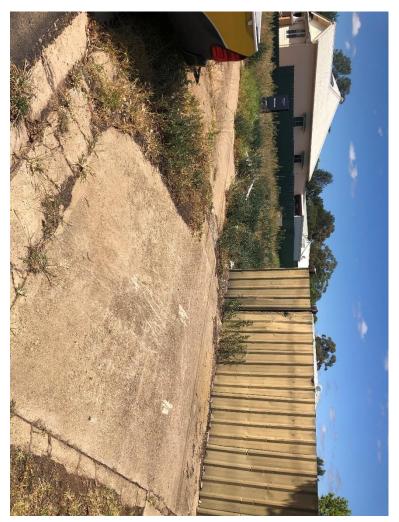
Photo C – Photo of driveway access from Gladstone Street.
